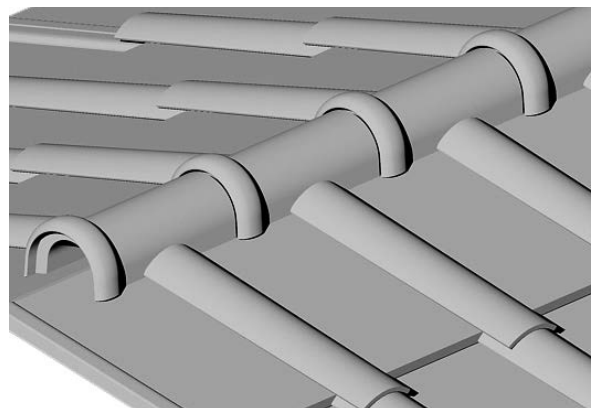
Graphic reconstruction of ridge tiles on a pitched roof.
